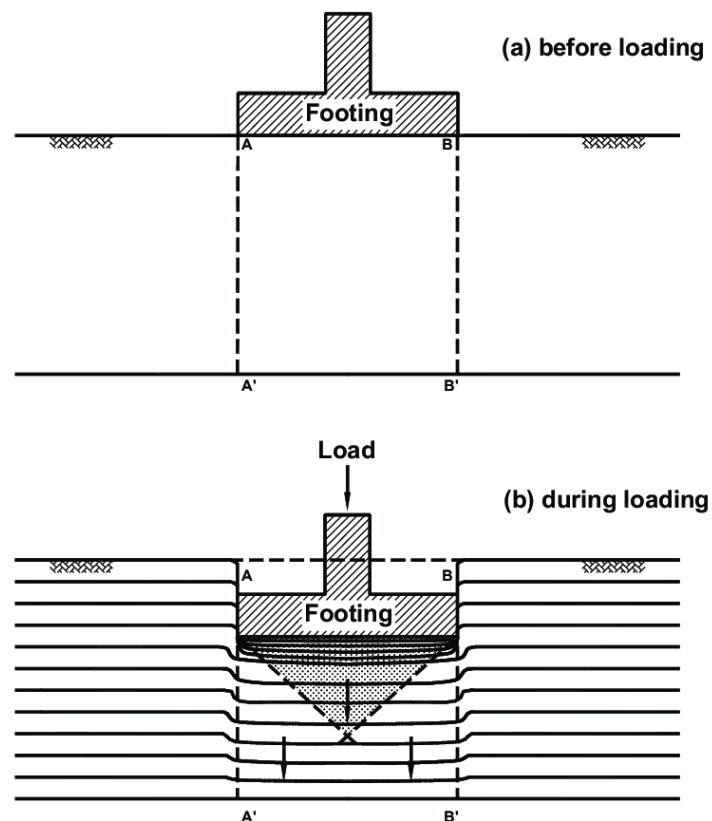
Punching shear failure of foundation resting on soft soil
